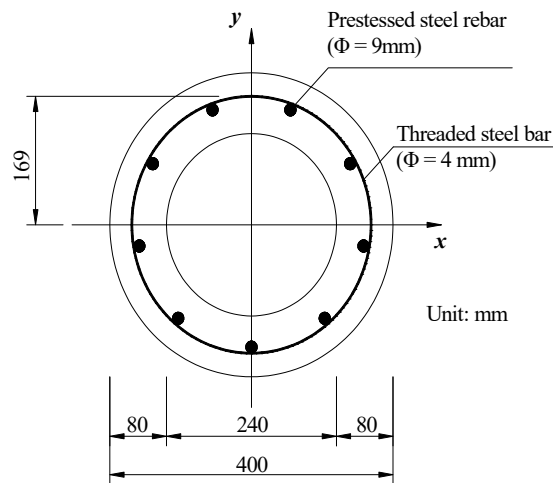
Cross section of the PHC pipe piles adopted for the buildings at the site.
